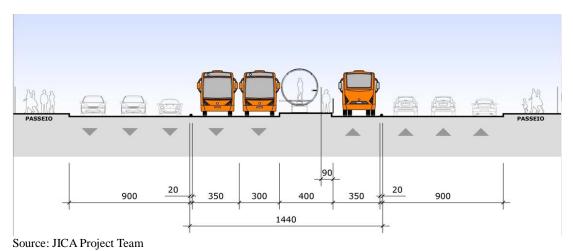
Typical Cross Section of Station Area with Overtaking Lane and Three Urban Traffic Lanes
